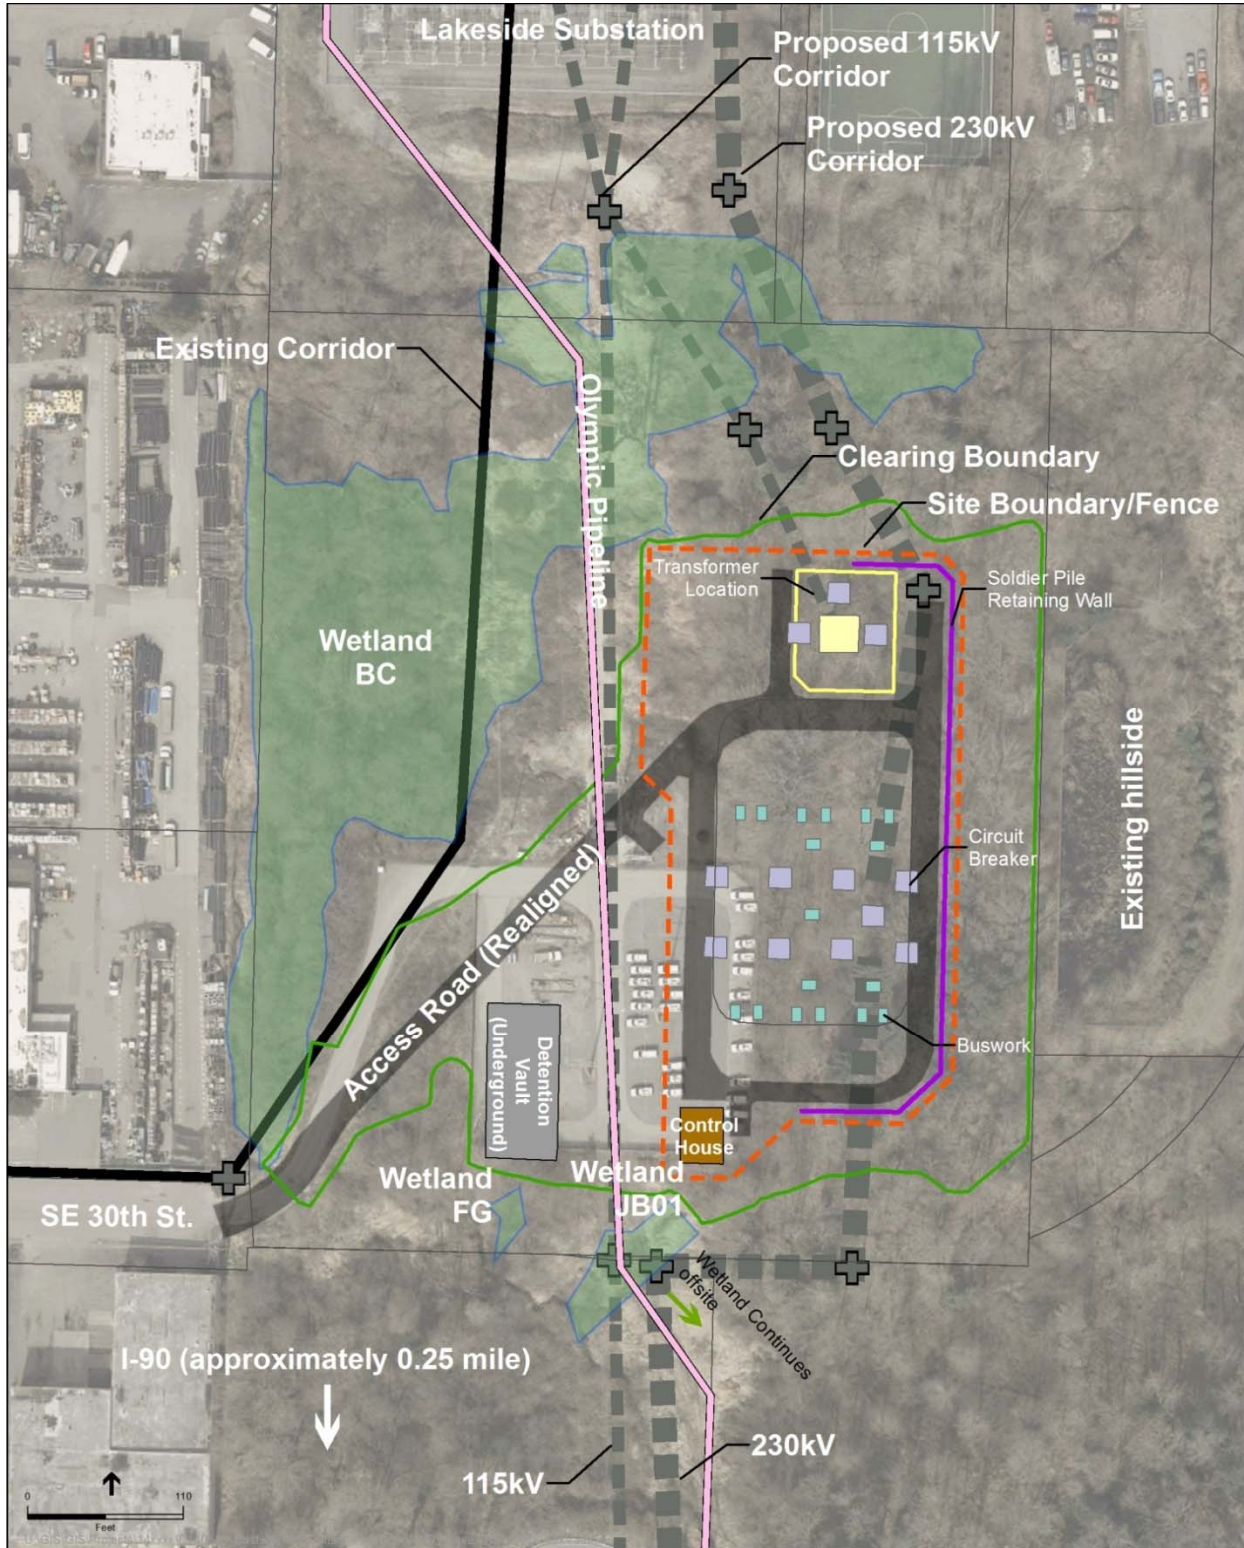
Conceptual Site Plan for the New Richards Creek Substation
